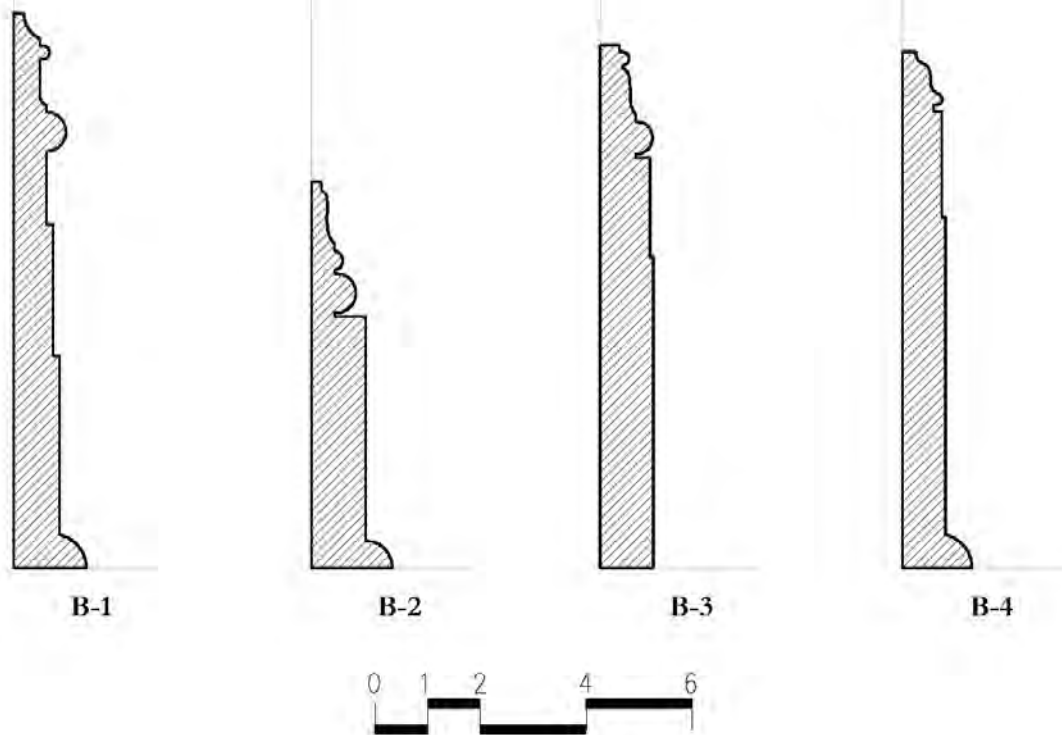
Variations in base molding profiles. Type B-1 is used in the first floor halls, vestibule, main stair landing, and second floor hall; Type B-2 (not shown) is used in the Dining (108) and Living (106) Rooms; Type B-3 is used in the first floor east rooms and the second floor corridor; Type B-4 is used elsewhere. (HA, 2015)
